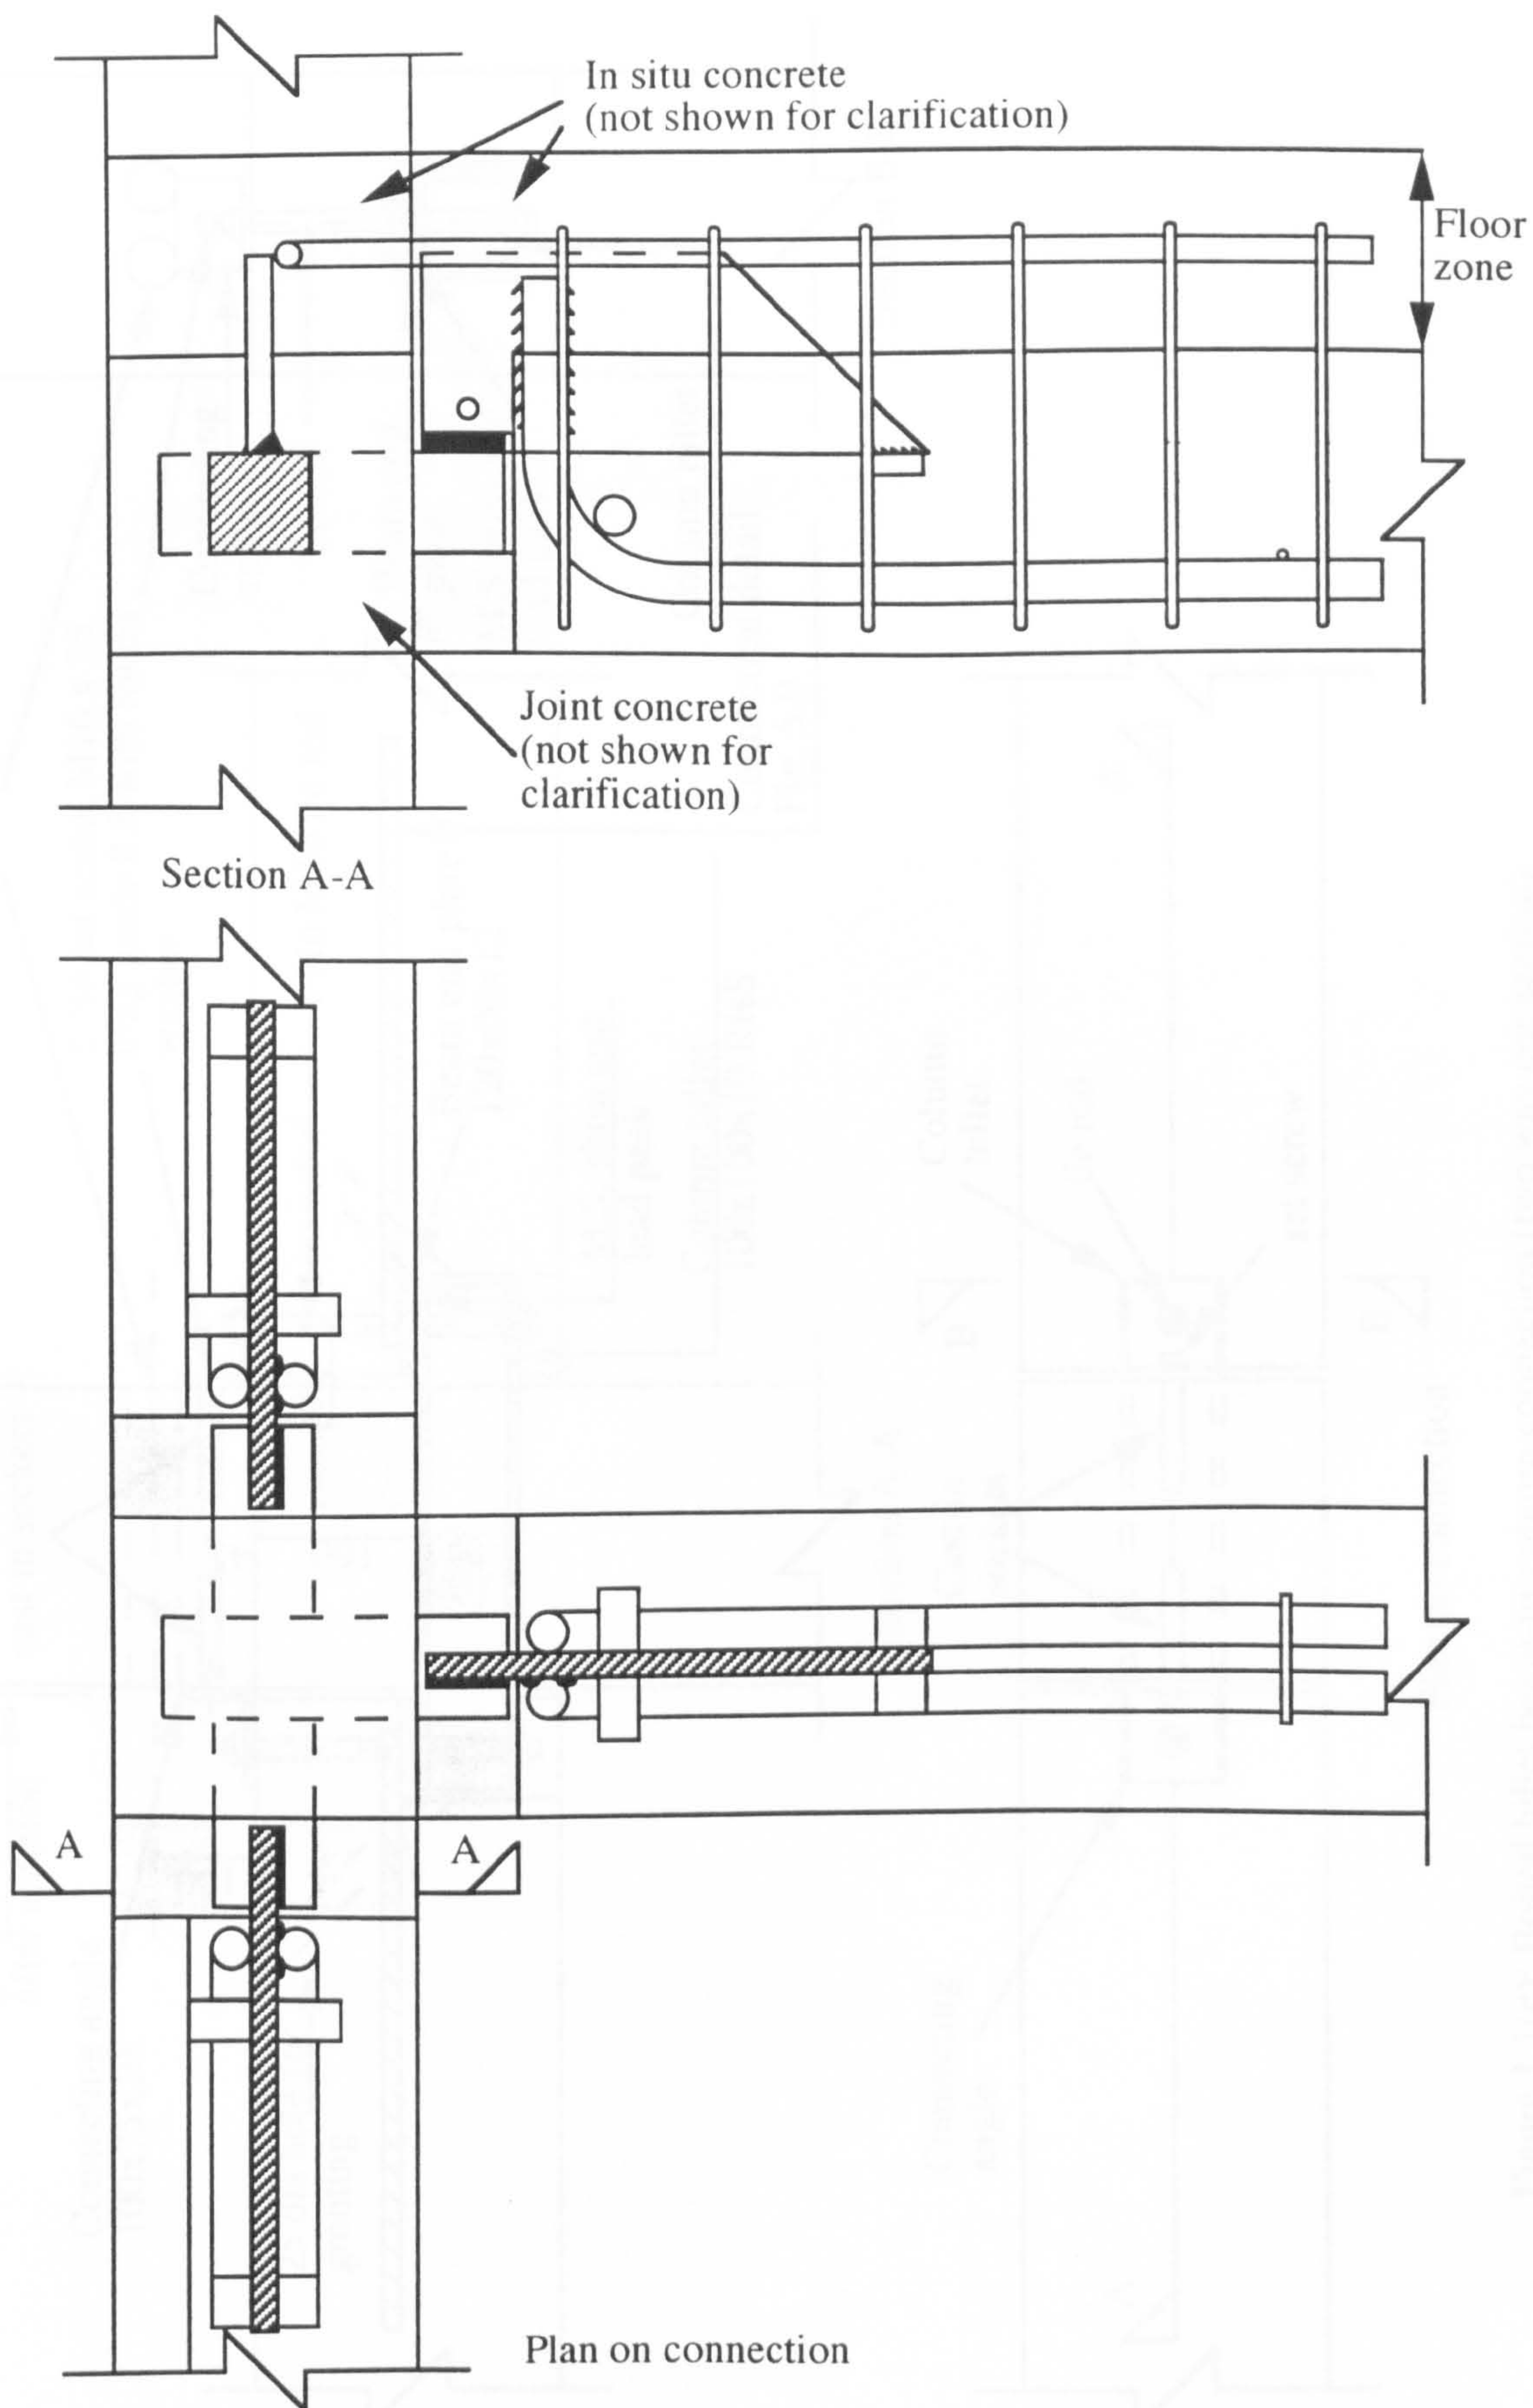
(b): Welded plate and billet beam-to-column connection
